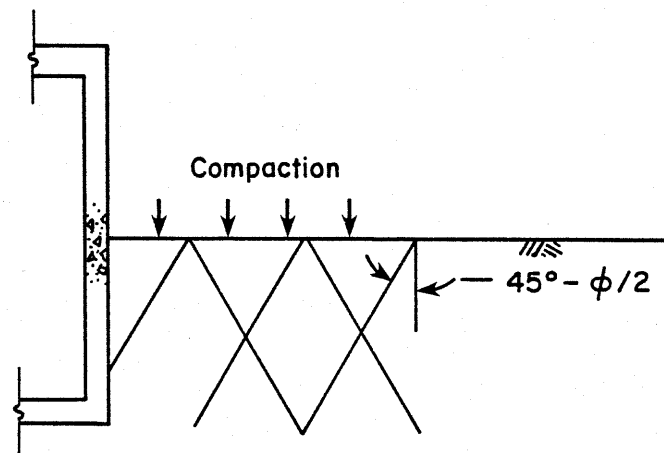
Shear Planes in Soil Adjacent to Culvert Subject to Compaction
